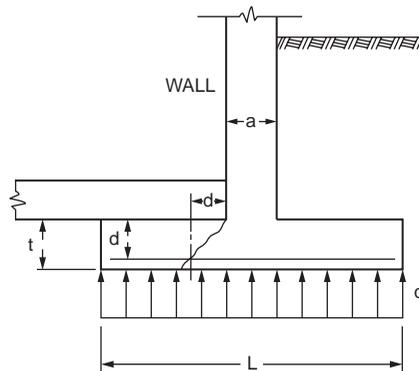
Reinforced-concrete wall footing. (Source: Wang and Salmon, 1985.)
